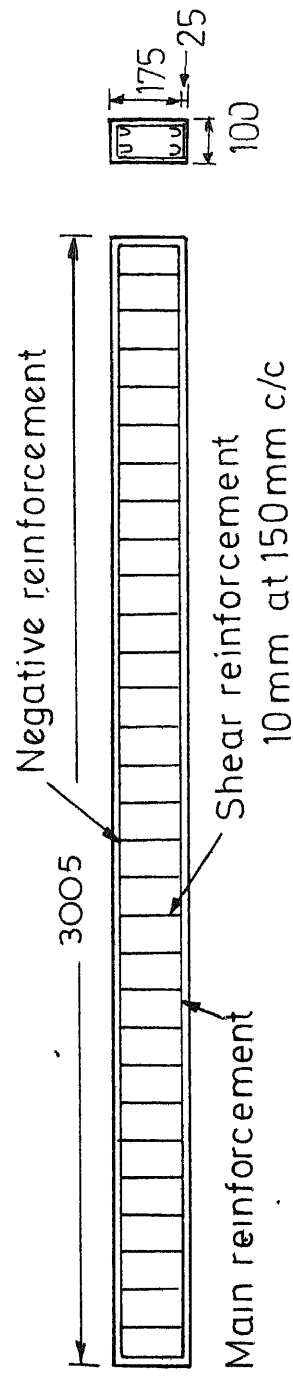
REINFORCEMENT DETAILS OF CONTINUOUS BEAM
